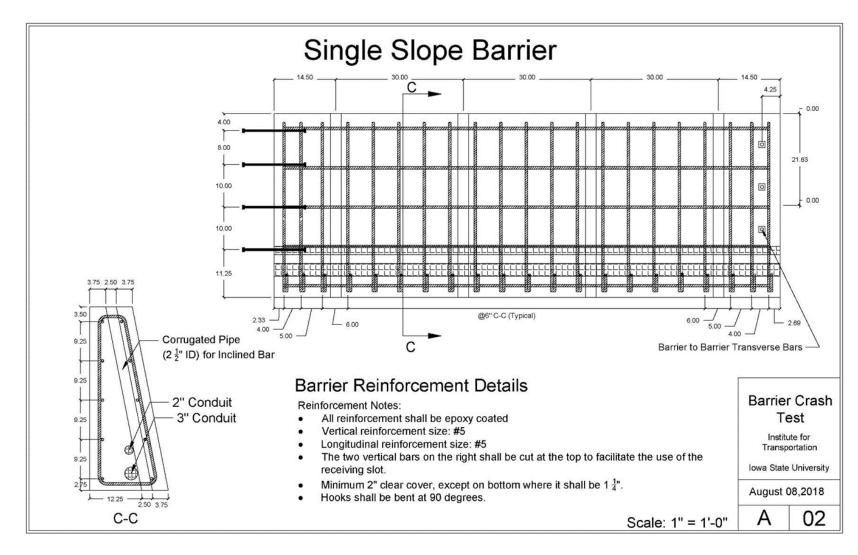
Single-Slope Barrier Segment, Reinforcement Details (Note: the spacing of the inclined tie-down bar was later reduced) [5]
